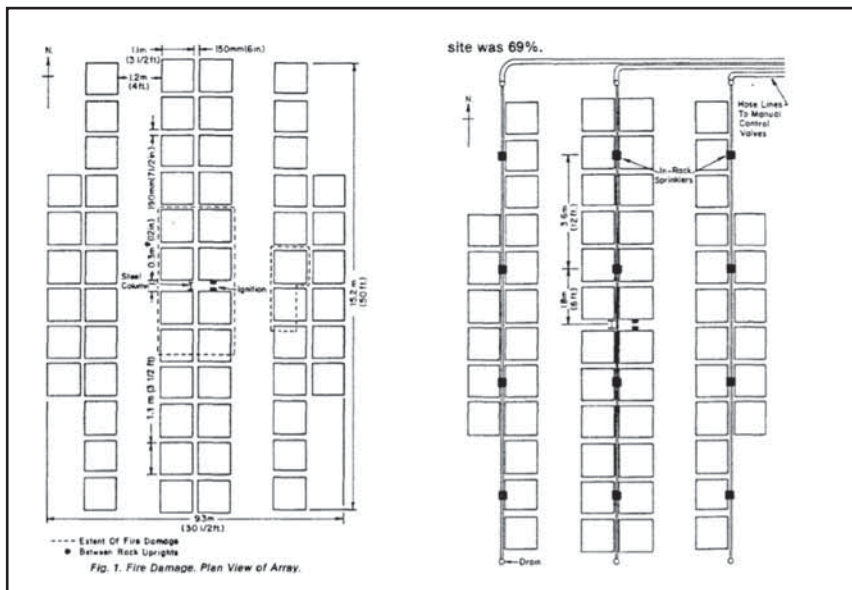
1981 FM Dry System Test - Fire Damage and In-Rack Sprinkler Layout
